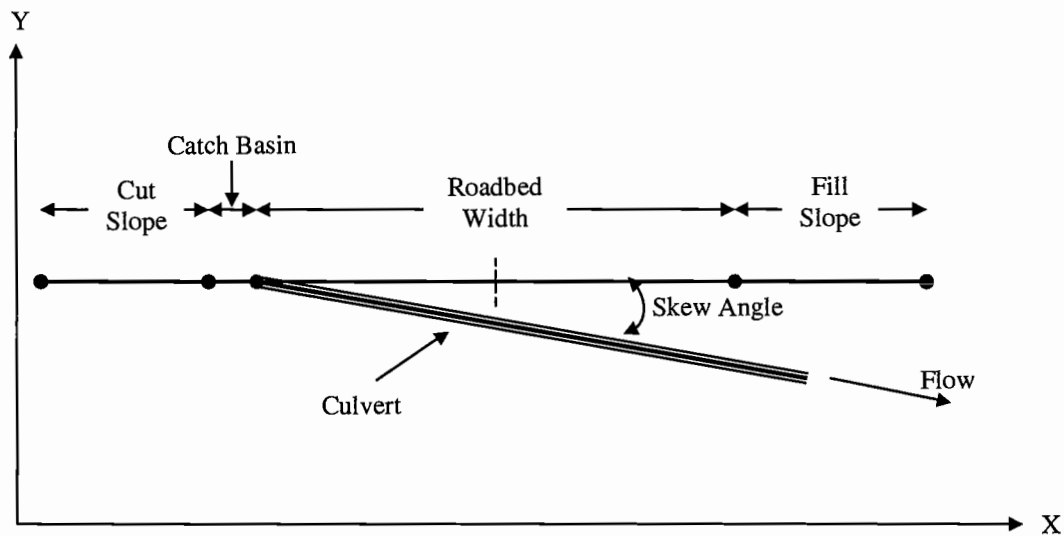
Plan view of the culvert on the cut and fill cross section.
